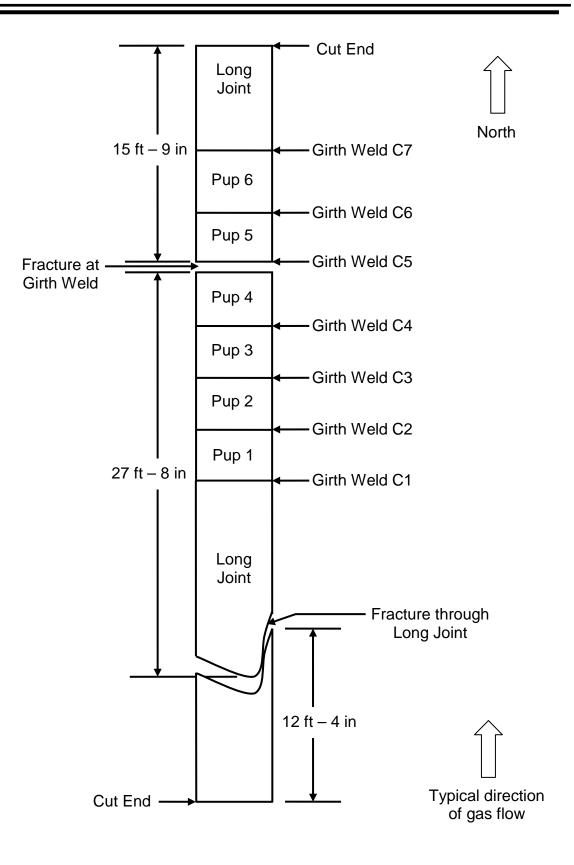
Schematic of pipe showing location of girth welds and fractures. Longitudinal fracture not depicted.
